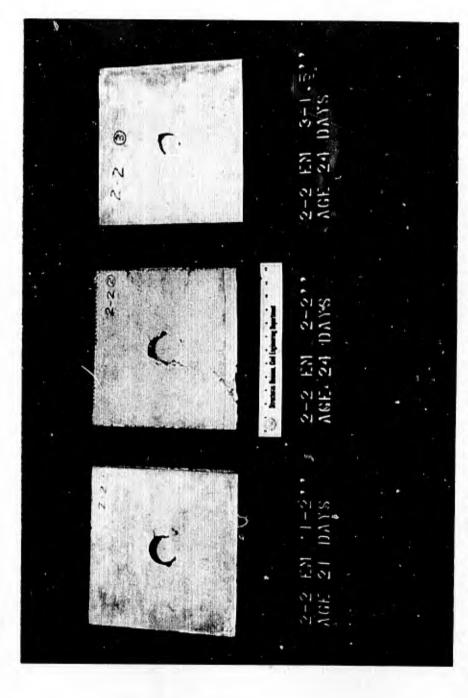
PIN CONTACT FACES OF 12"x12" PANELS, AS LABELLED, AFTER LOADING TO FAILURE IN PUNCHING SHEAR
